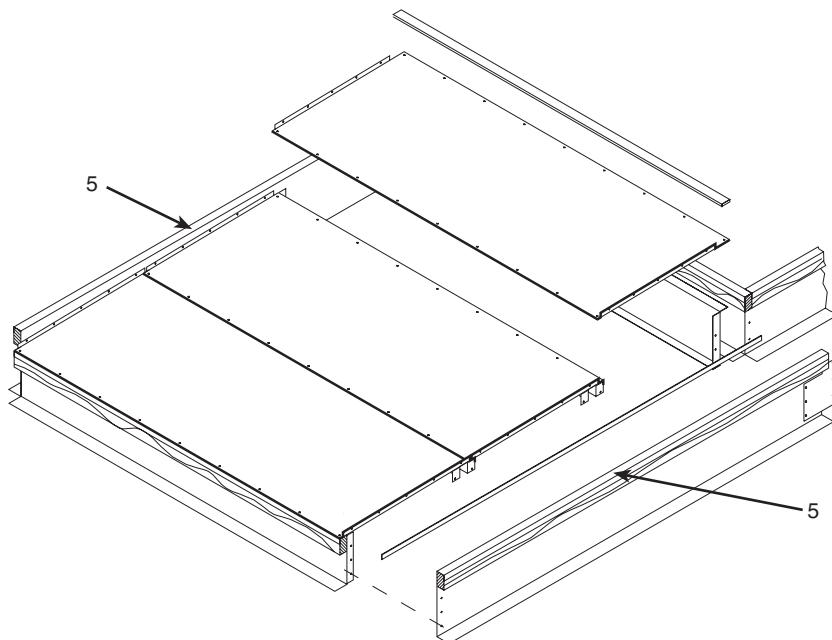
Gasket Location — Condenser Section Roof Curb (Size 055-105 Units)
